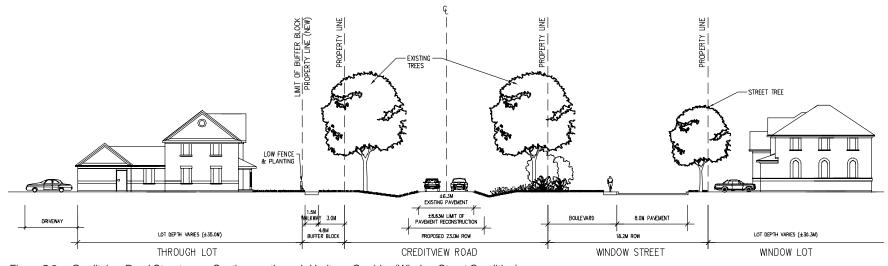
Creditview Road Streetscape Section a-a through Heritage Corridor (Window Street Condition)
